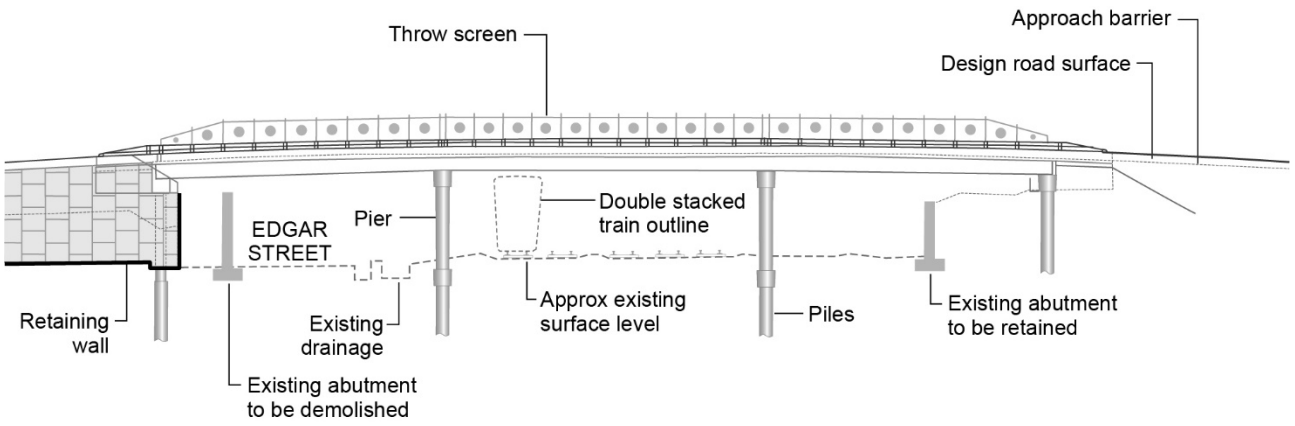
INDICATIVE KEMP STREET BRIDGE
